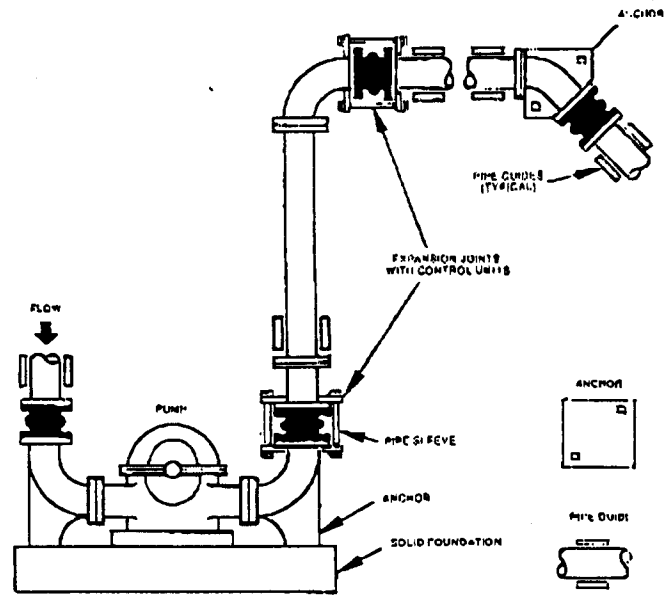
C: Typical Piping Layout Showing The Use Of Control Units With The Expansion Joints When Proper System Anchoring Is Limited
